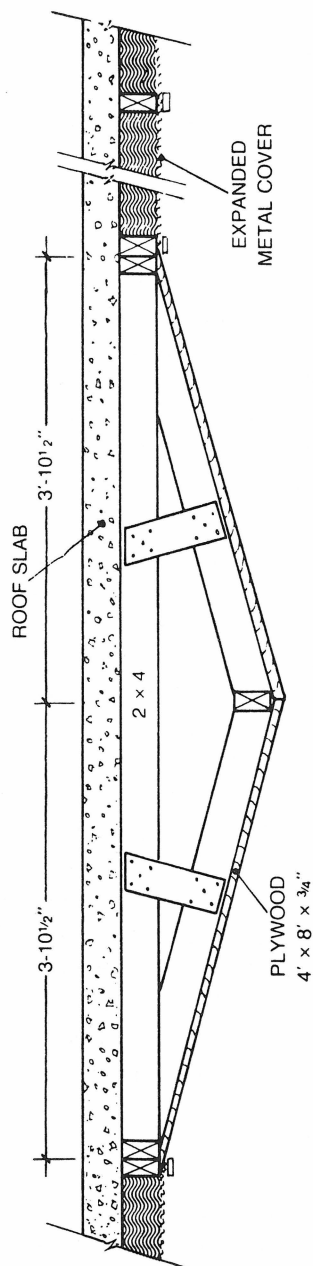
Details of construction of ceiling plywood diffuser/absorber.
